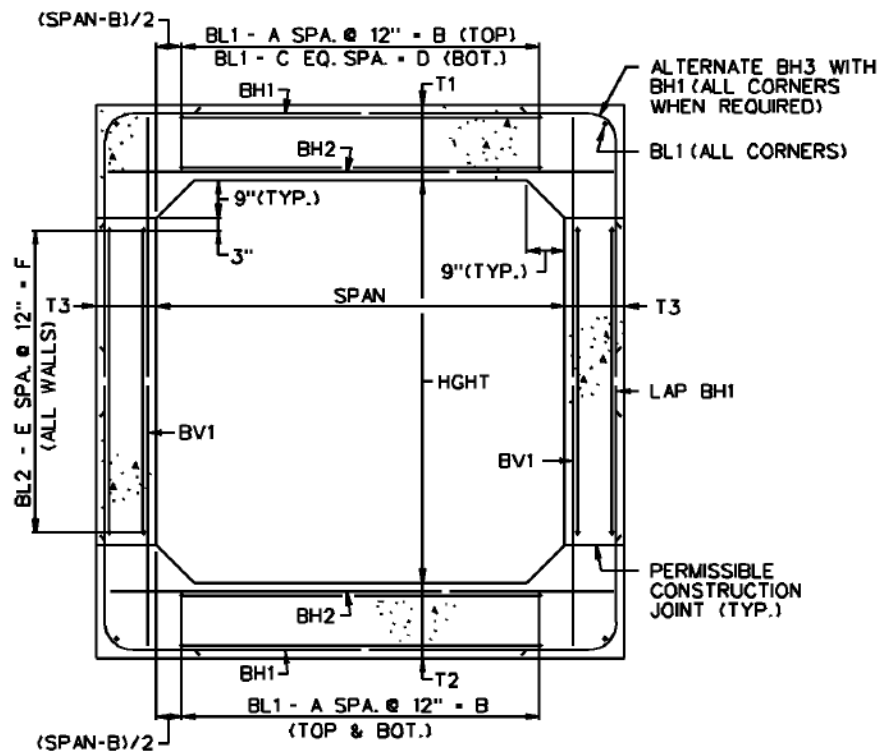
Typical VDOT Single Barrel Cast-in-Place Box Culvert Cross Section (VDOT 2008)
